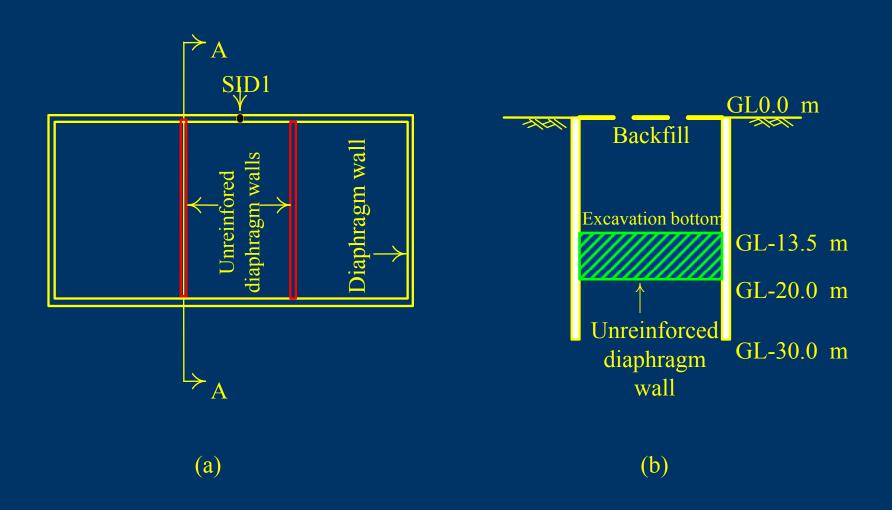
Cross walls in excavations (a) plan (b) profile
